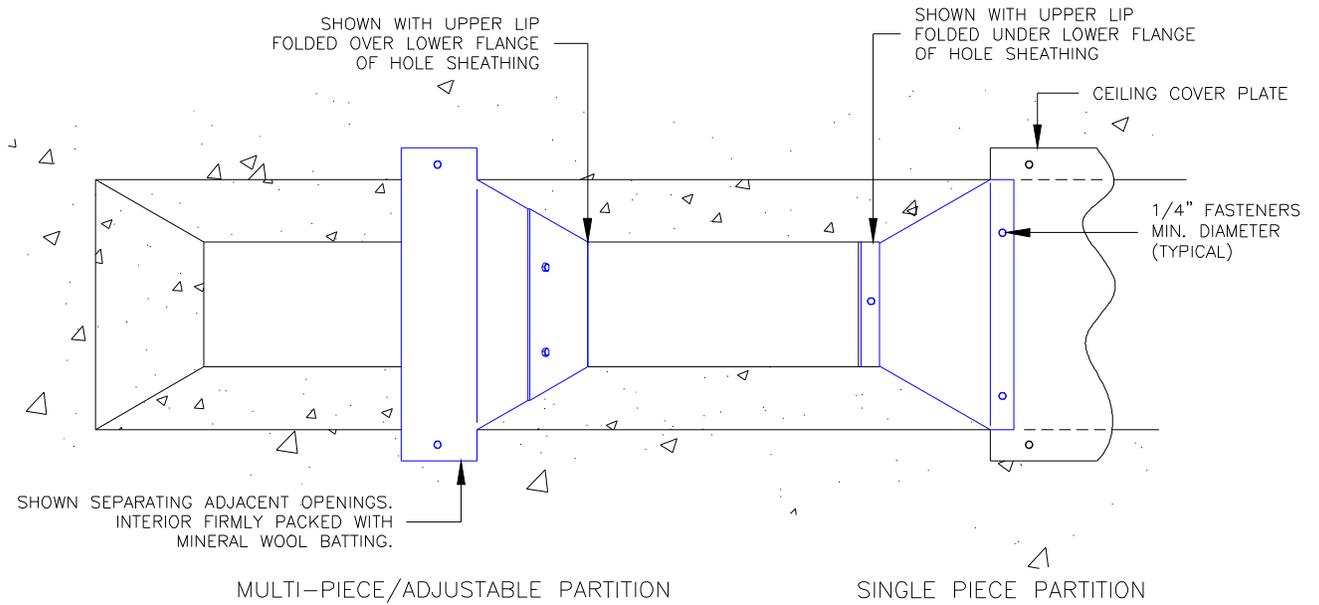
CABLE HOLE SET-UP FOR COMPOSITE SHEET PRODUCTS
